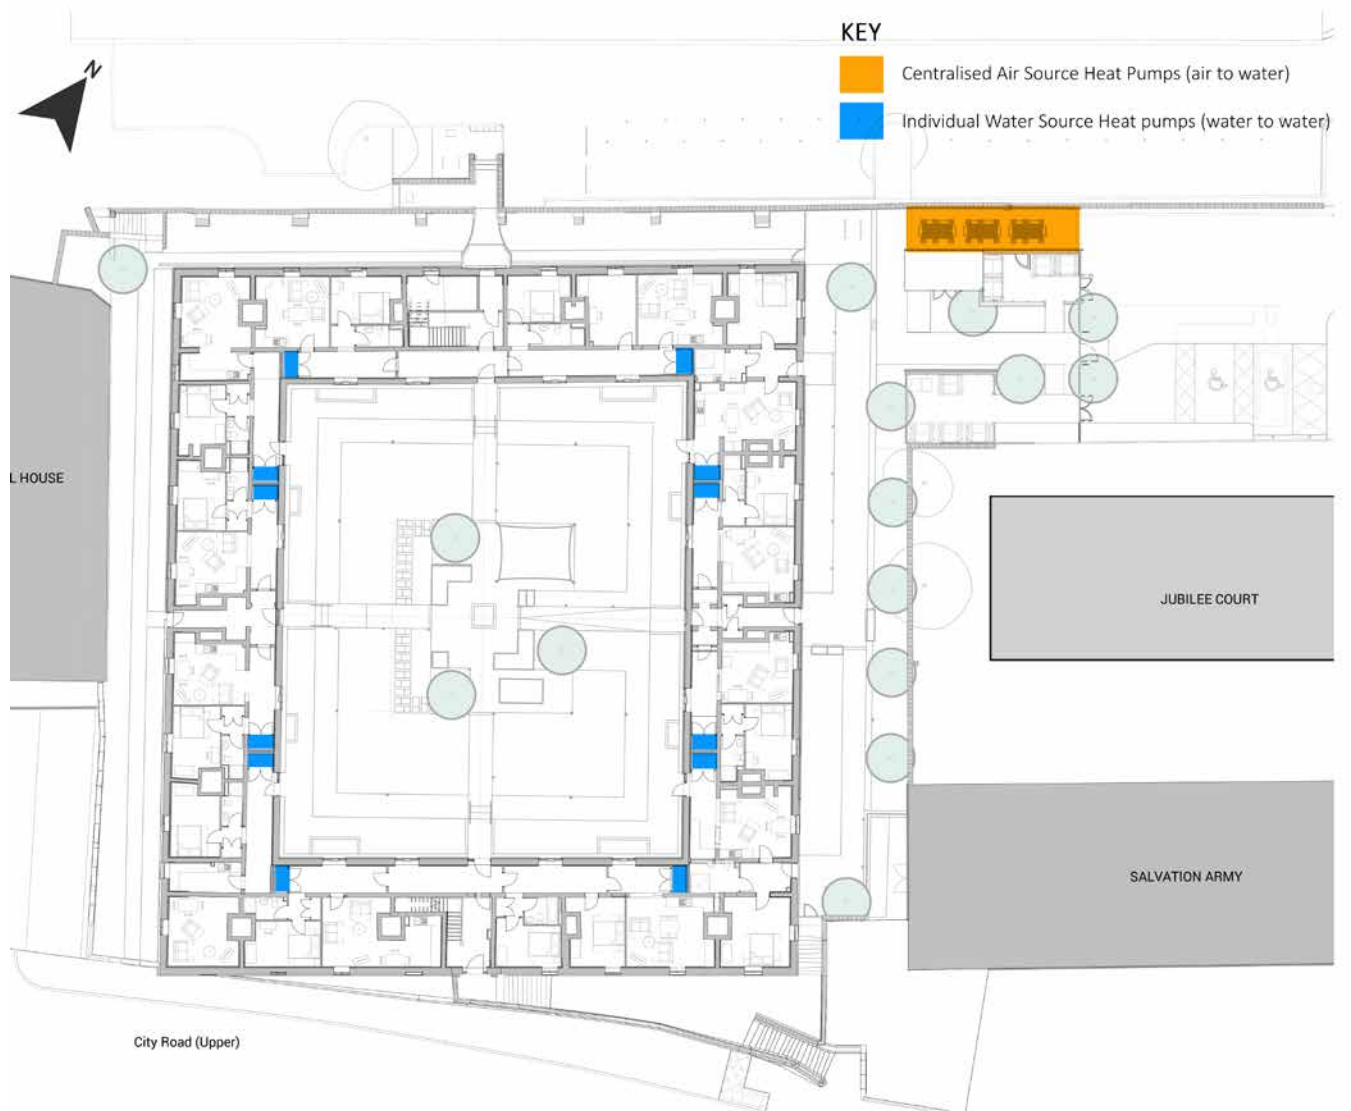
Diagram showing location of external centralised air source heat pump enclosure and internal individual water heat pumps within each apartment. © JDDK Architects Ltd.
